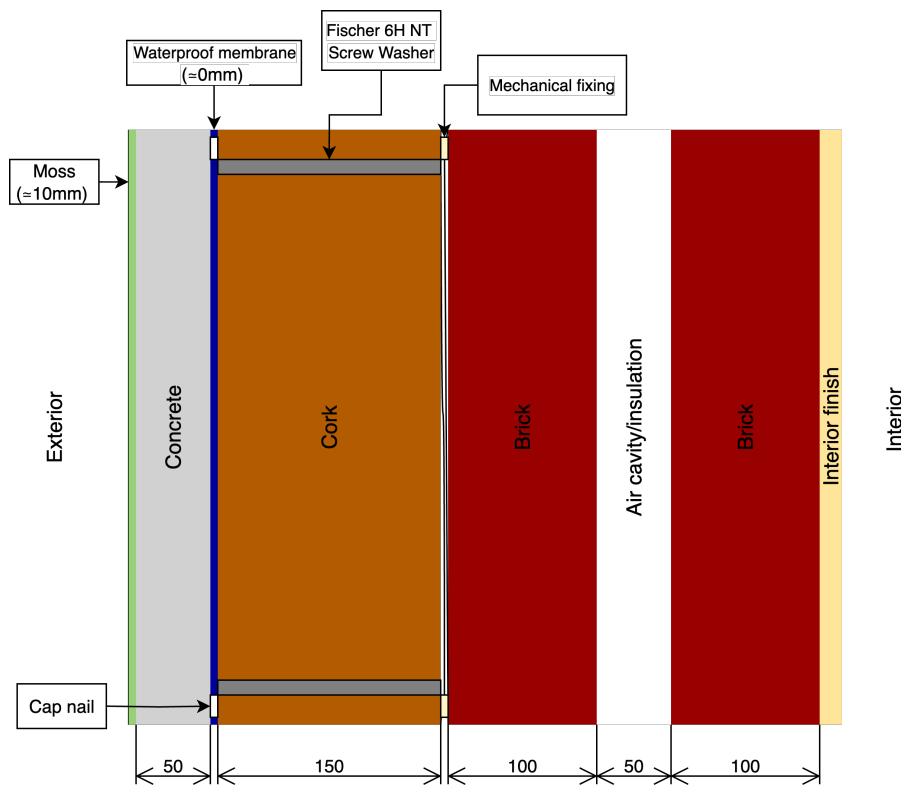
Multilayered facade system with concrete, cork insulation, and moss layer applied to an existing exterior brick wall as a retrofitting solution.
